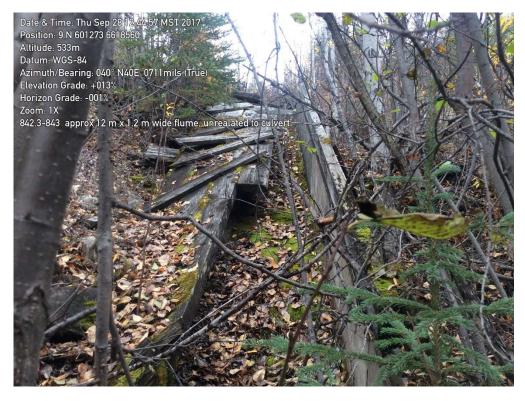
Site 2 (Km 841.95 to 844.40) - Timber Flume - Photo 1 of 1
